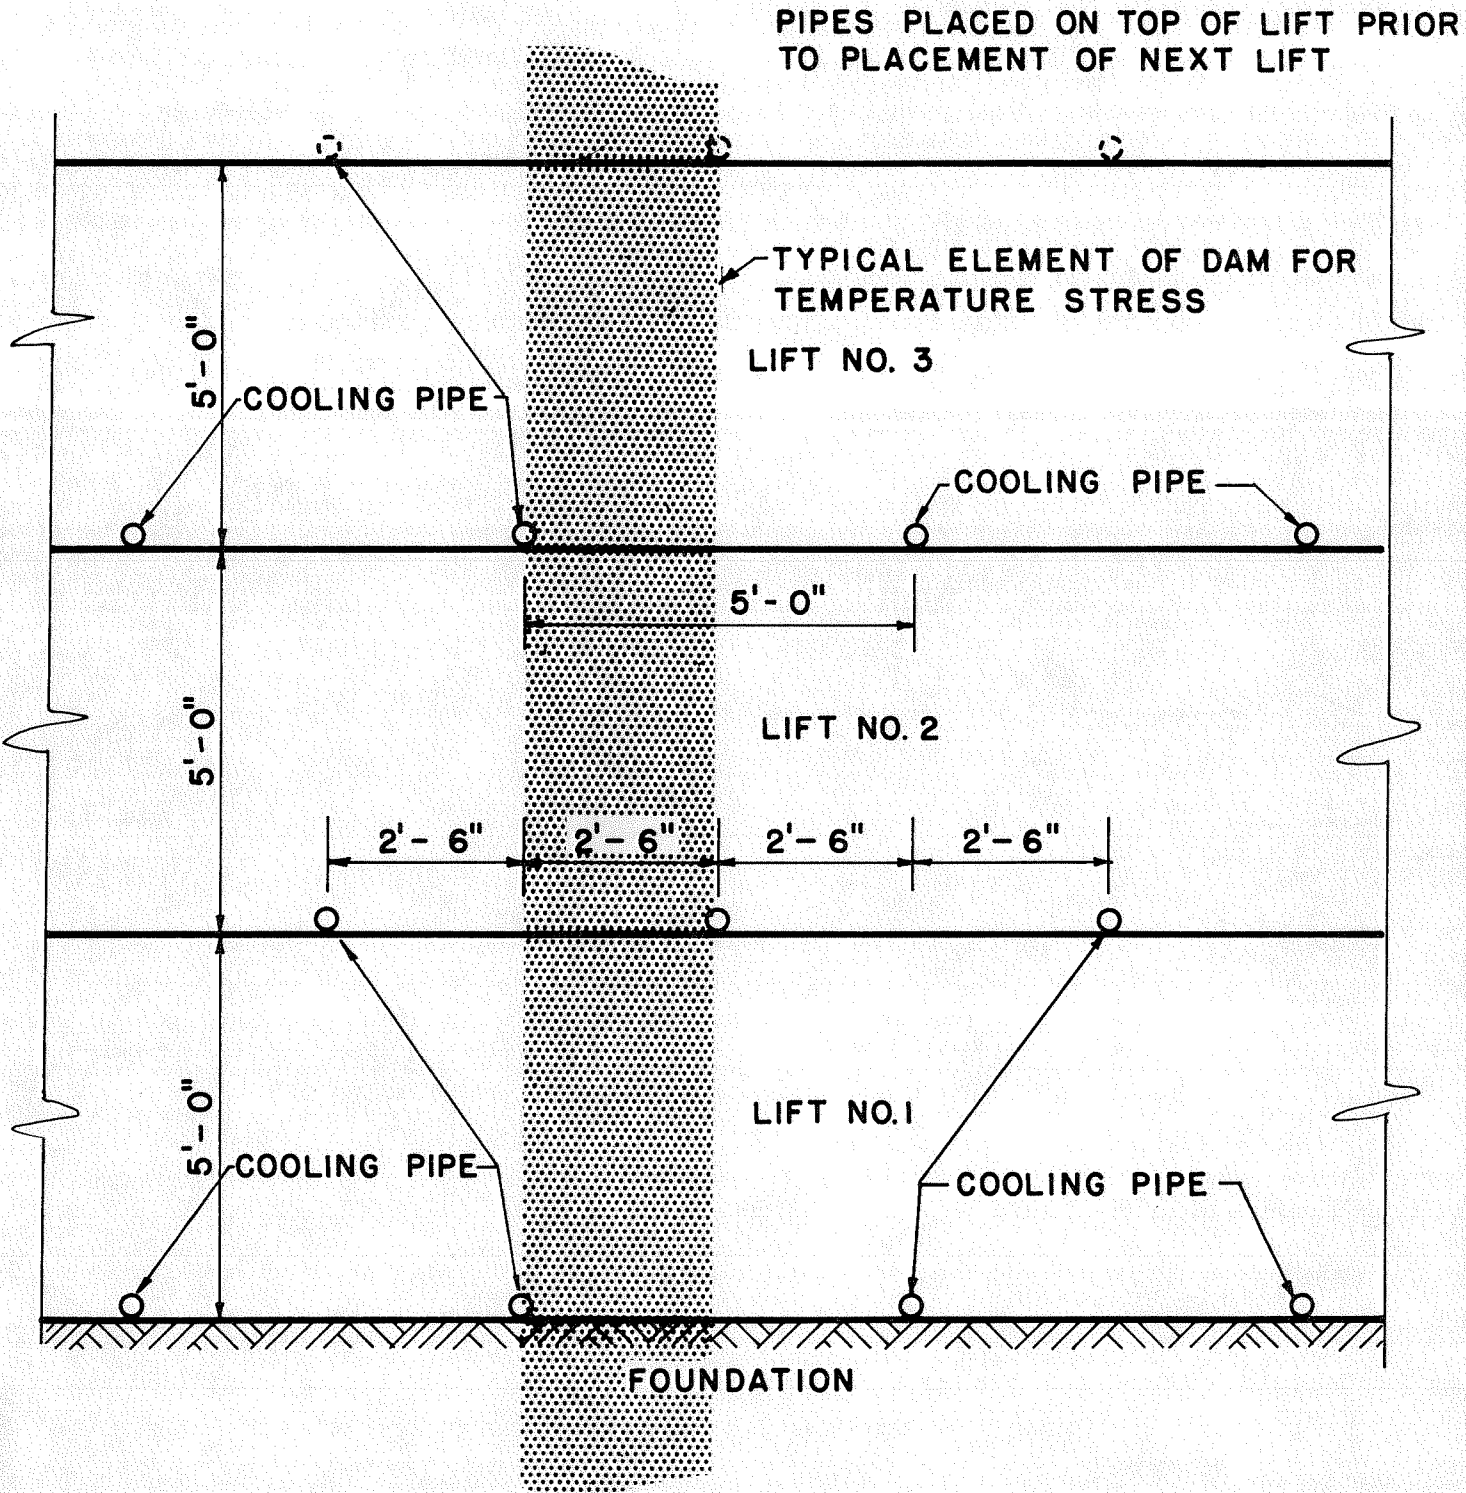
TYPICAL ARRANGEMENT OF COOLING PIPES
